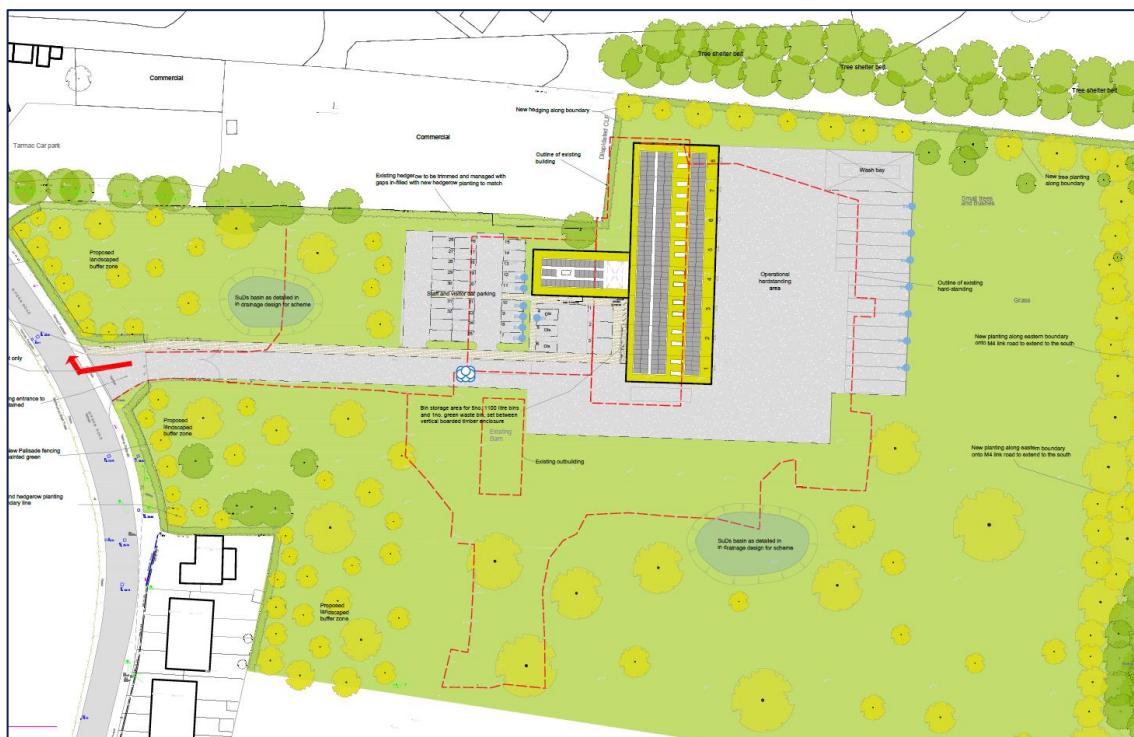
The Proposed Site Plan, the red dashed line shows the outline of the existing hardstanding and building footprints.
